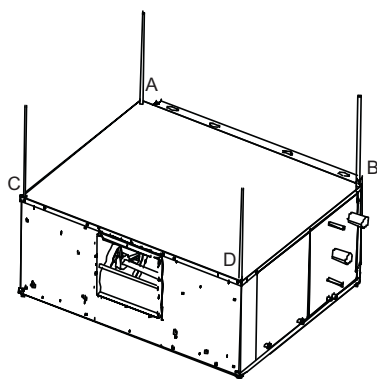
42BHE Units Mounting Details - Threaded Rod Suspension
